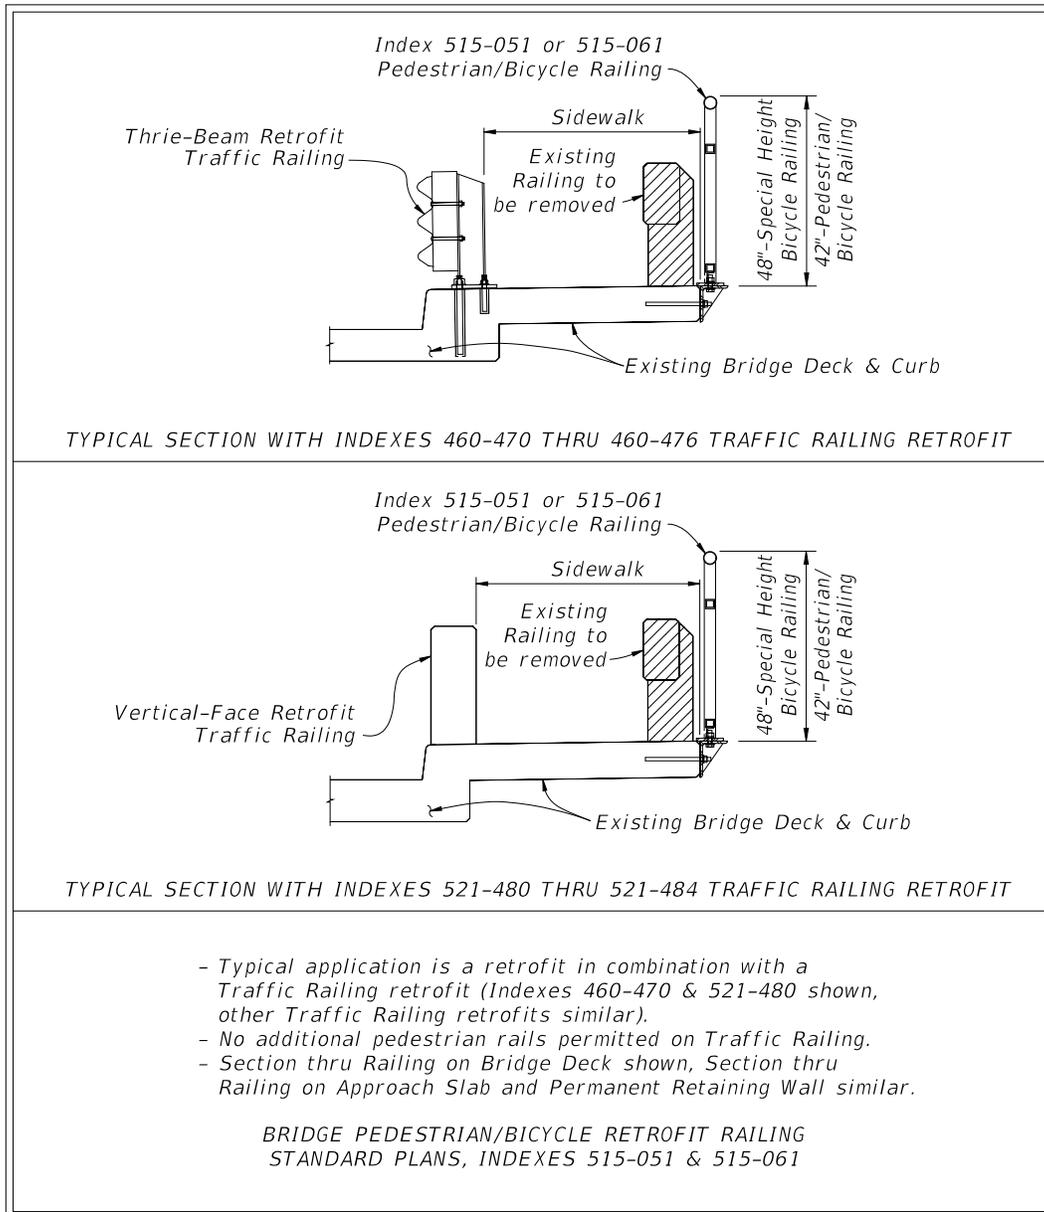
Bridge Railing and Bridge Parapet Fencing
